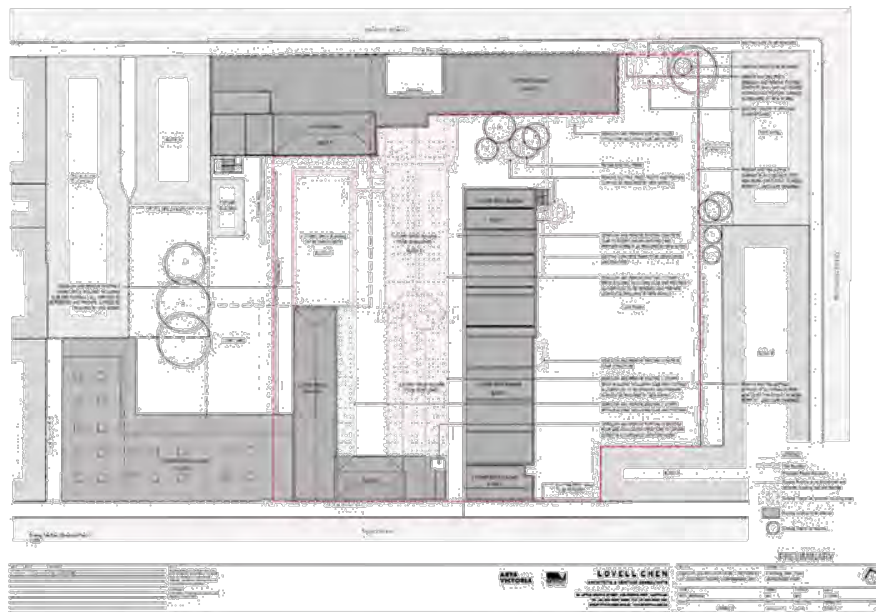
Buildings Proposed for demolition on the Existing Johnston St. Site
